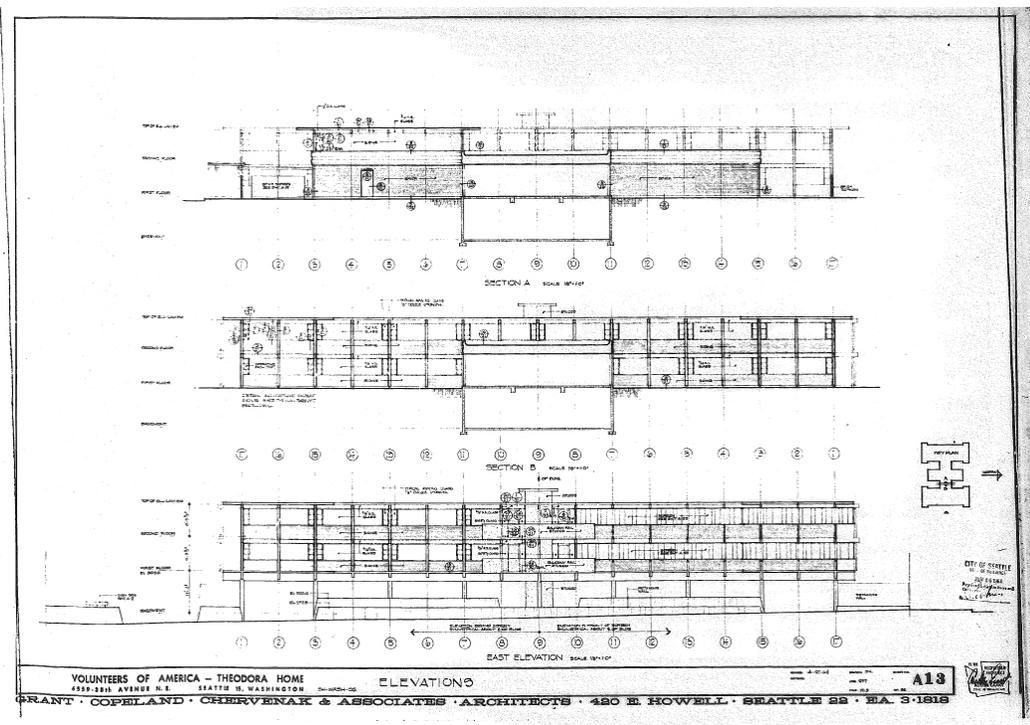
Original Elevations (Seattle Department of Planning and Development archives)
